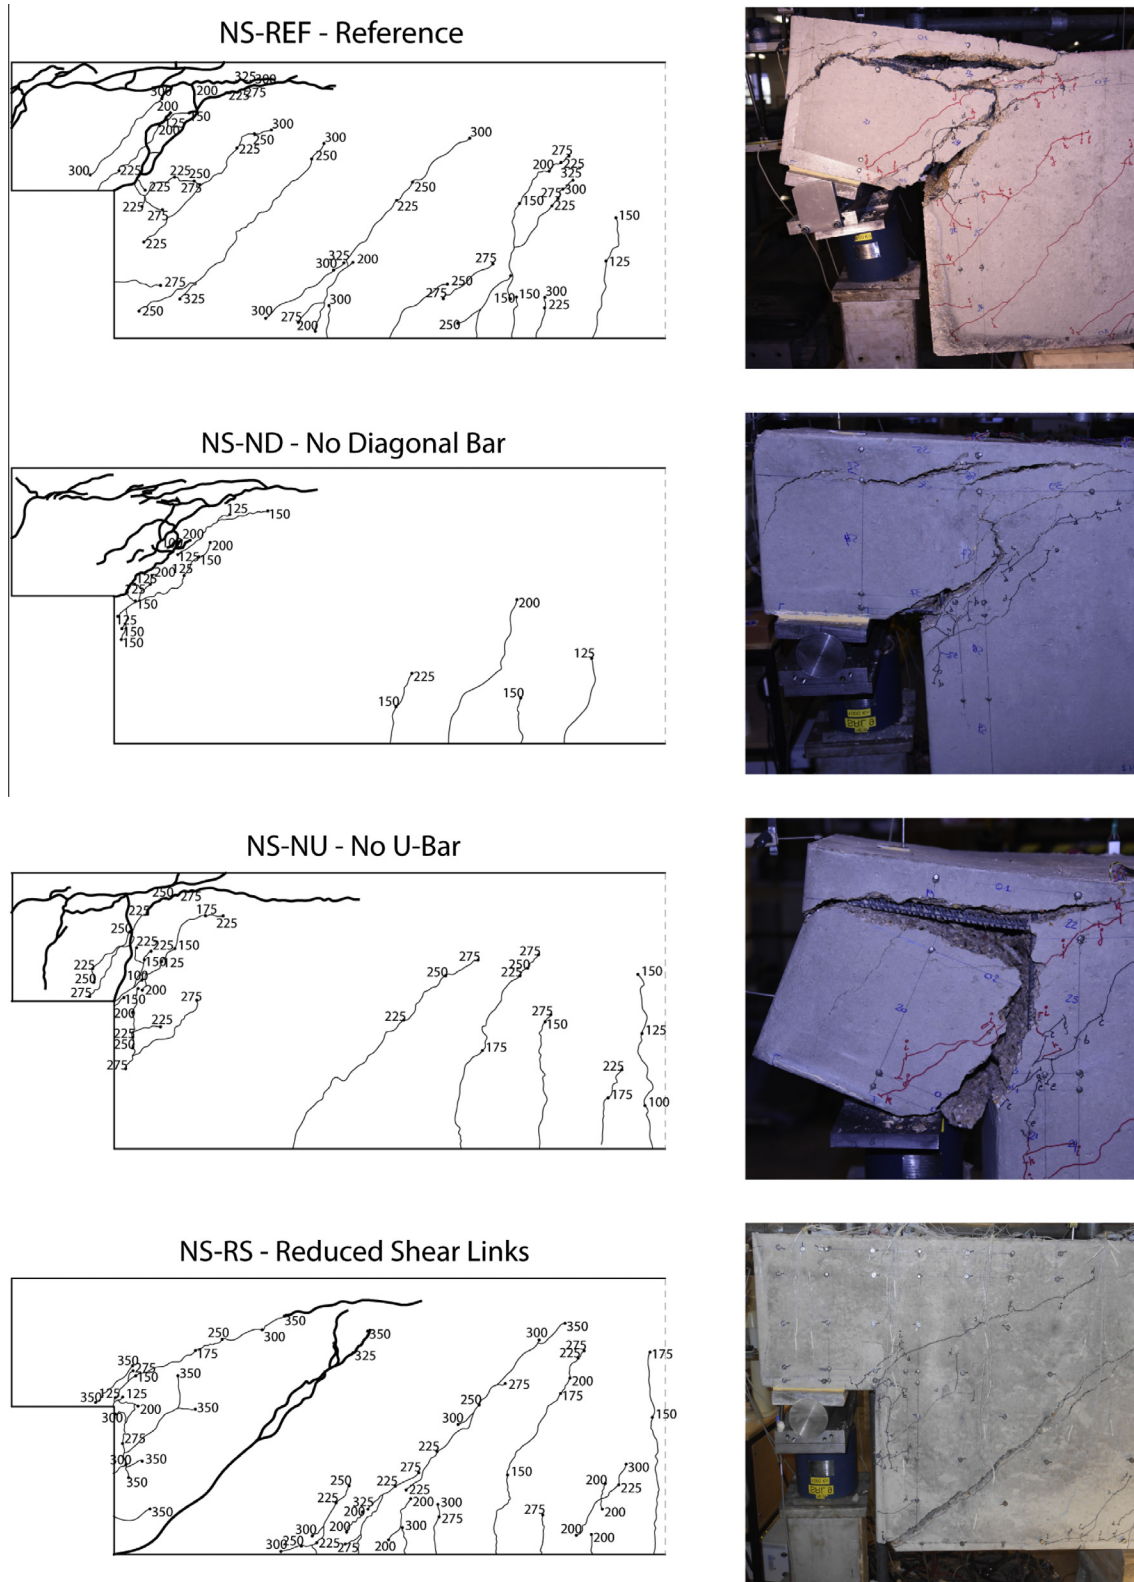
Final crack pattern of tested reinforced concrete half-joint beams.
